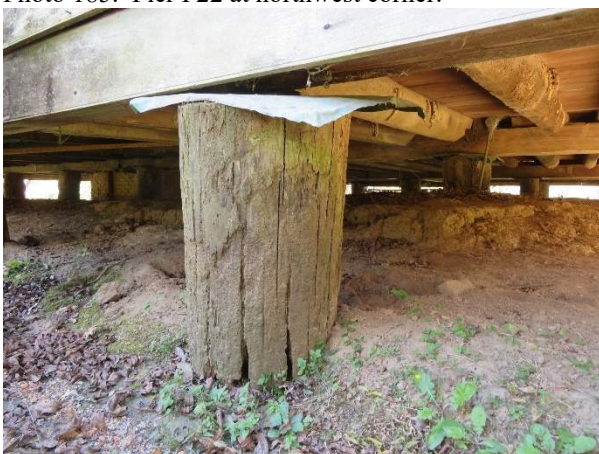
Pier P23 has settled due to deterioration and is no longer supporting the perimeter beam.
